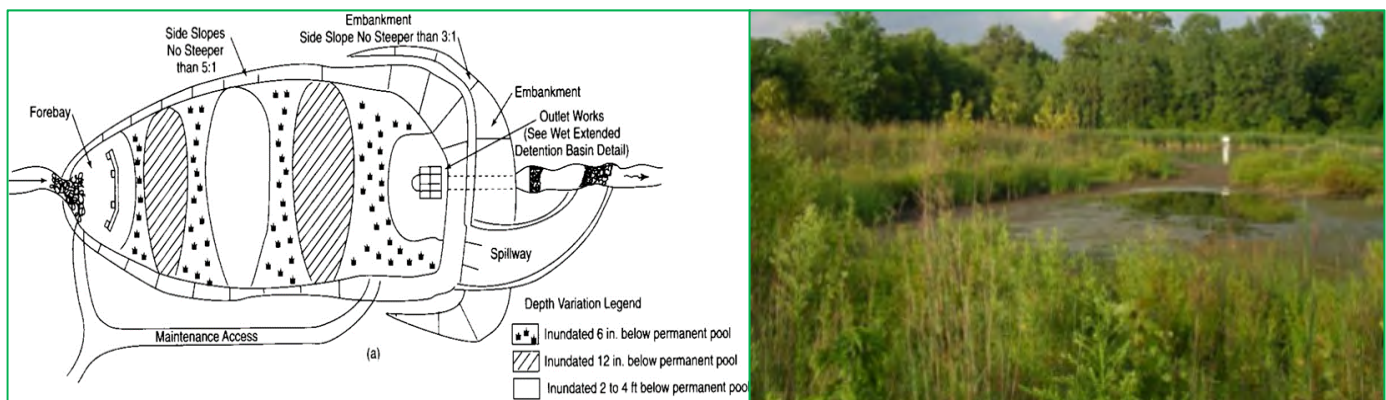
CONSTRUCTED WETLAND DESIGN PLAN VIEW (LEFT) AND TYPICAL CONSTRUCTED WETLAND INSTALLATION (RIGHT)
